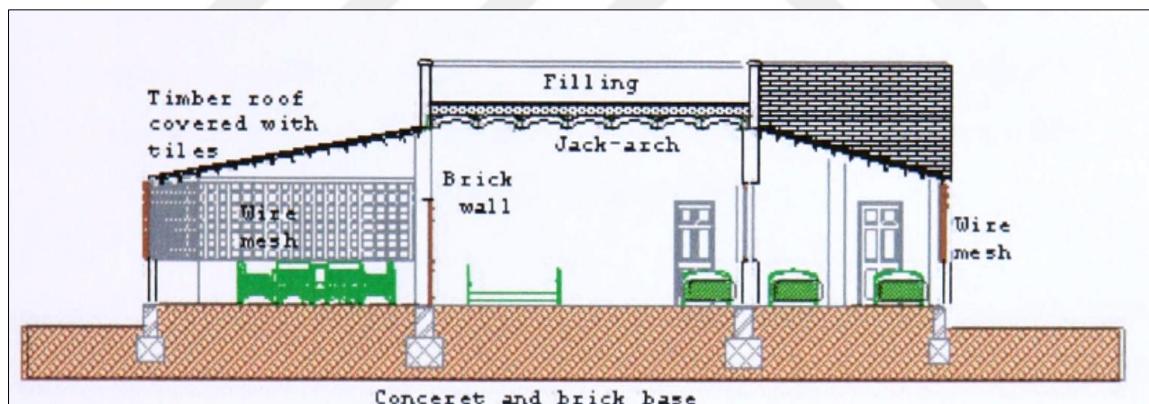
Section of a traditional house built with red brick in Sudanese village (Taha, 2005)
